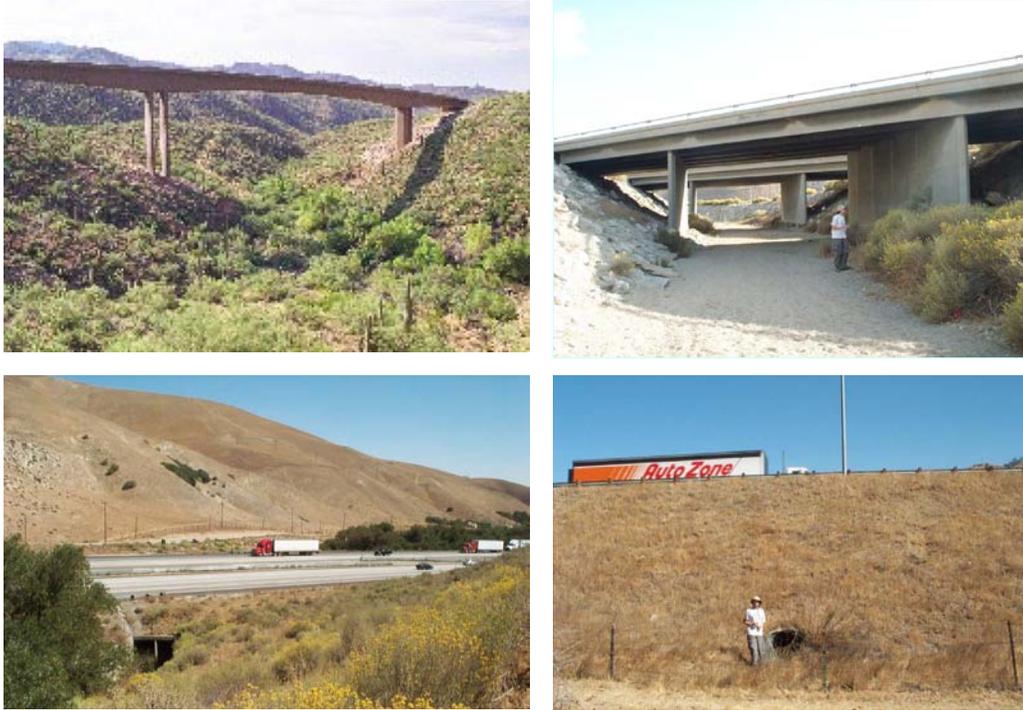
Examples of existing potential crossing structures (from left to right): viaduct, bridge, cement box culvert, and drainage pipe (in a fill slope).
